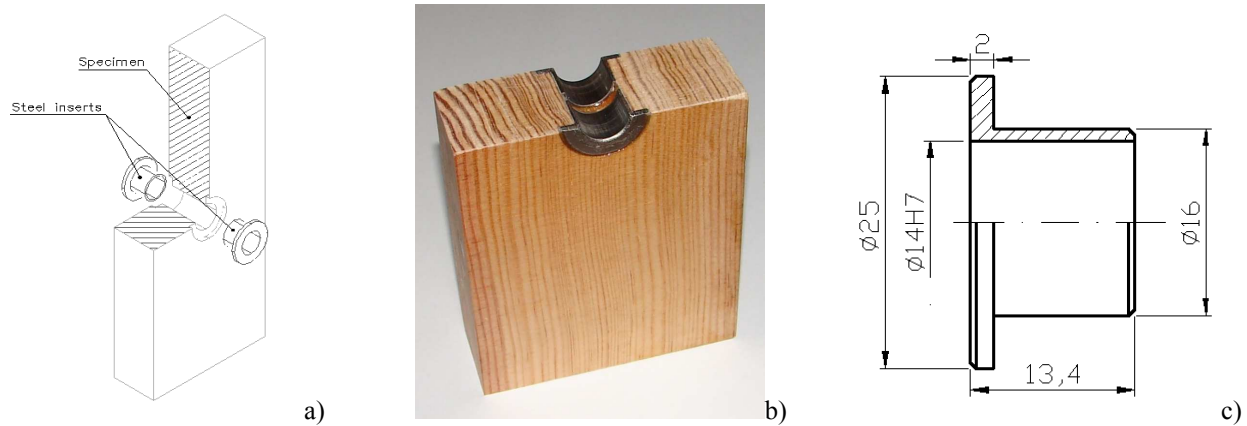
Reinforcing technique based on the application of metallic inserts: a) assembly process; b) section view of a reinforcing member; c) geometry and dimensions of the metallic insert (dimension in mm).
